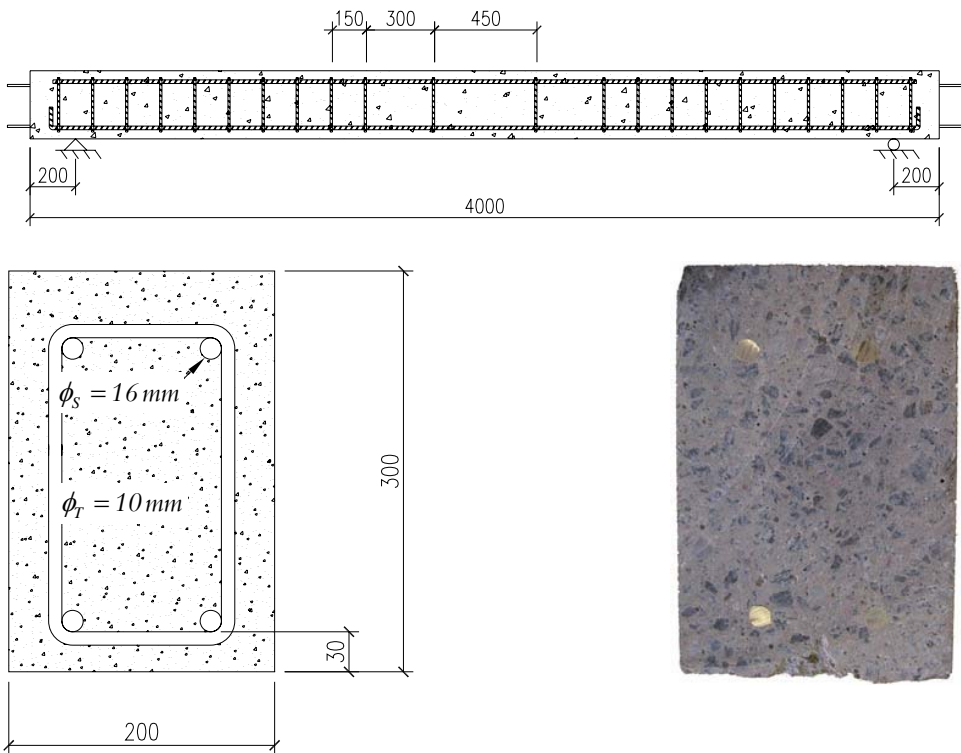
Top: Beam specimen measurements and steel reinforcement layout. Bottom left: Cross sectional view of intact beam. Bottom right: Cross section of real intact beam.
